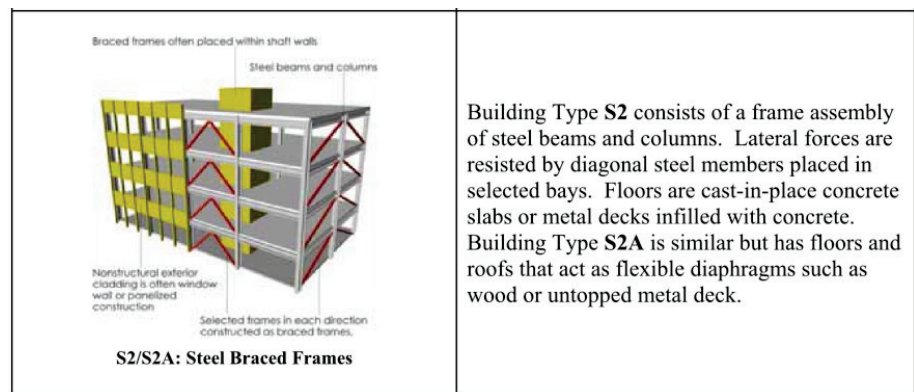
Steel braced frame archetype (S2) from FEMA 547.
